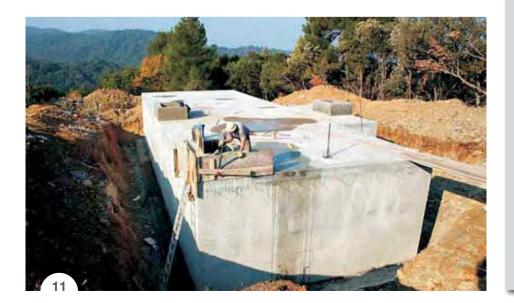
ULTRACOLOR PLUS was used for grouting tiles' and stone slabs' joints. PHOTO 11. The new fire fighting water tank was waterproofed with MAPELASTIC.
